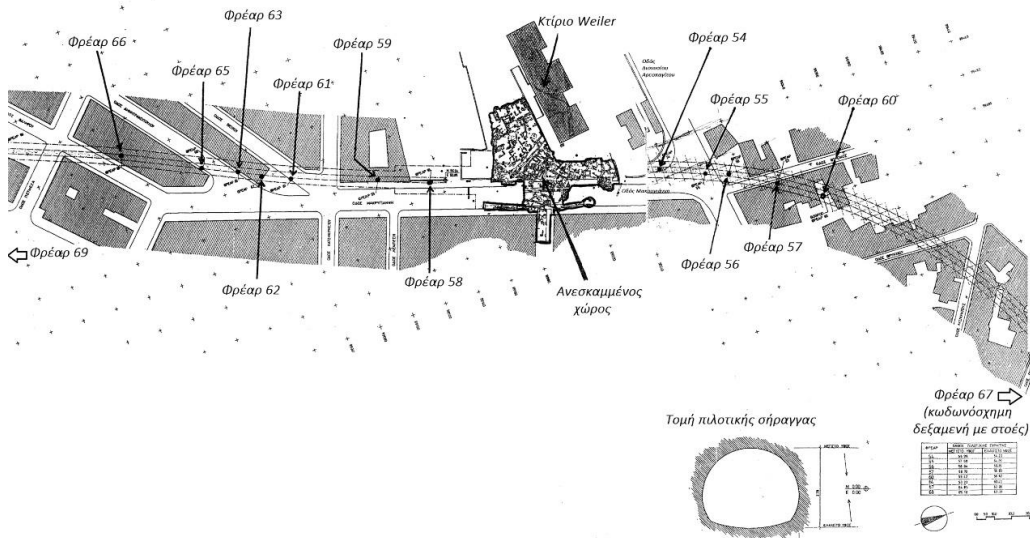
General plan of the tunnels excavated by the T.B.M. with the wells found (A' E.Π.Κ.Α. archives).
